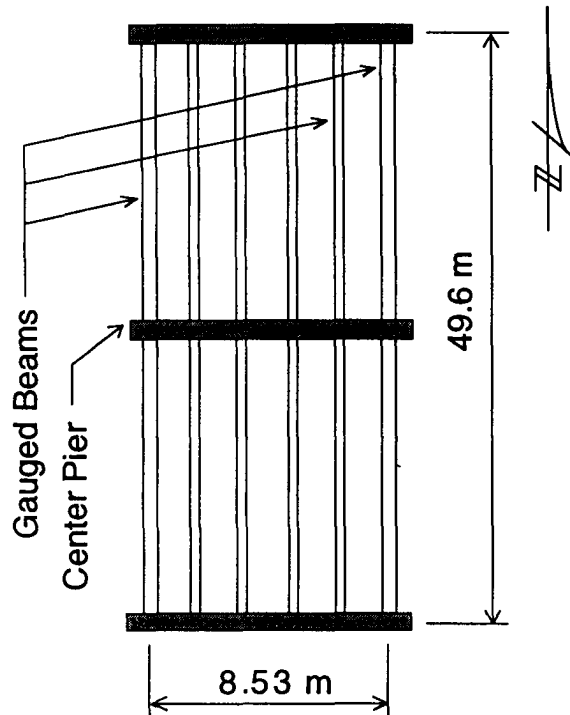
Plan view showing the location of gauged girders in the Clallam Bay bridge.
